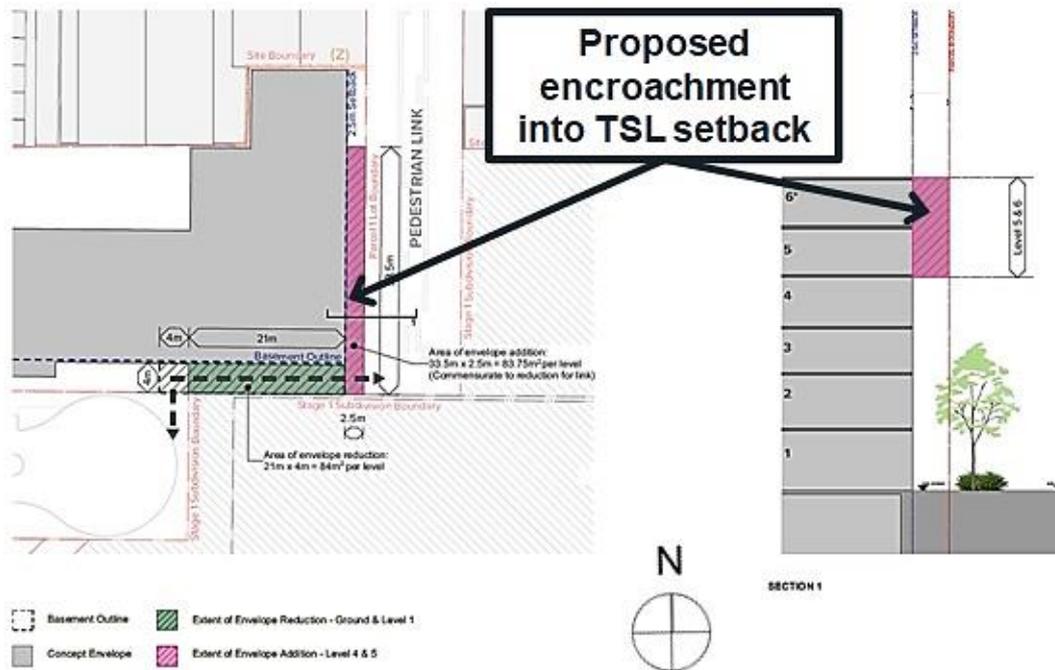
Plan and section diagrams of proposed upper level envelope encroachment into TSL setback
